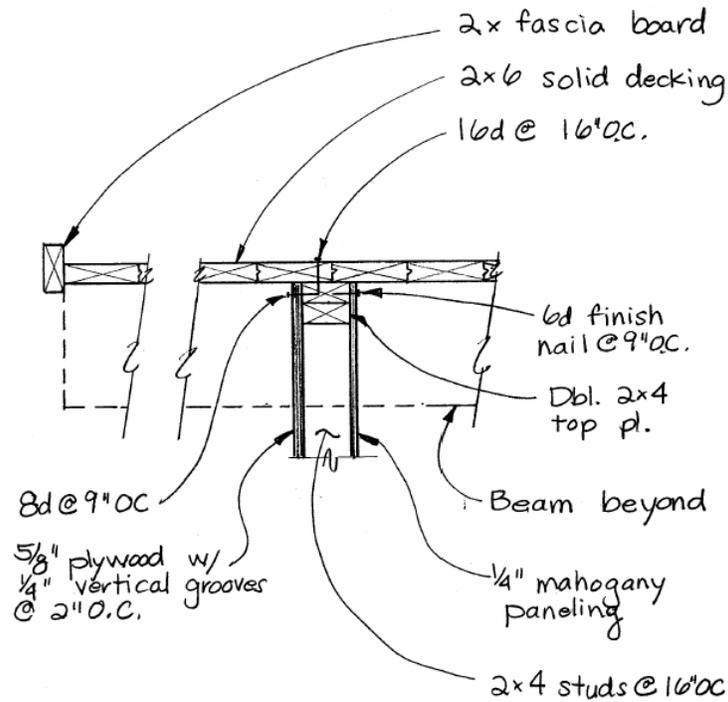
Index building 3 top of exterior wall parallel to deck (detail 4-S3)
